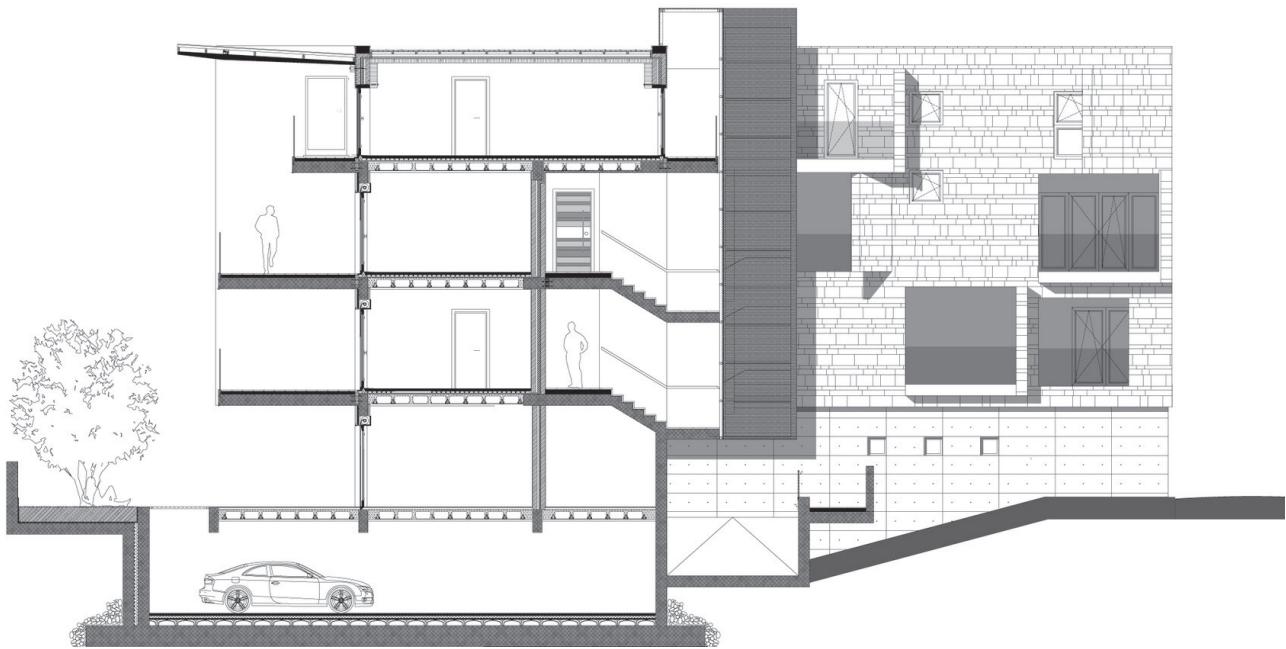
Detail composition of cross-section and elevation, originally drawn at 1:50 scale, of a residential building in Pescara (2009-2012). Detail drawing by the author.
